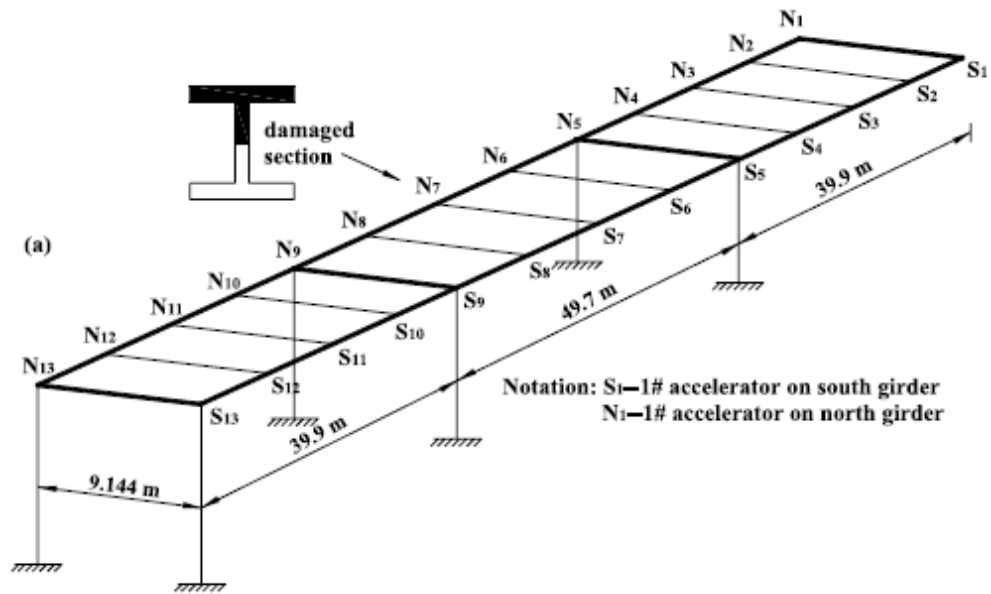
Simplified I-40 bridge model with accelerometer layout
